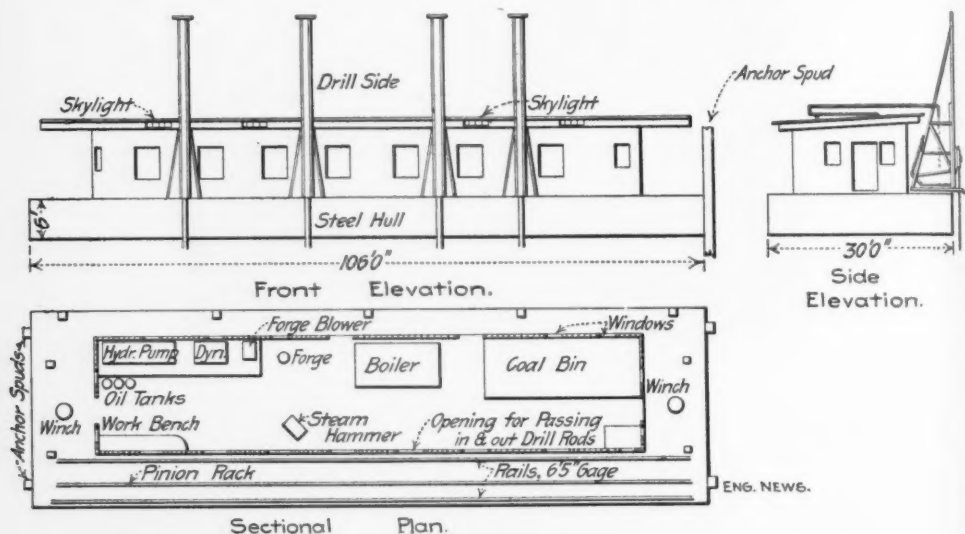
PLAN AND ELEVATIONS OF DRILL BOAT FOR USE IN SUB-AQUEOUS ROCK EXCAVATION, BUFFALO, N. Y.
